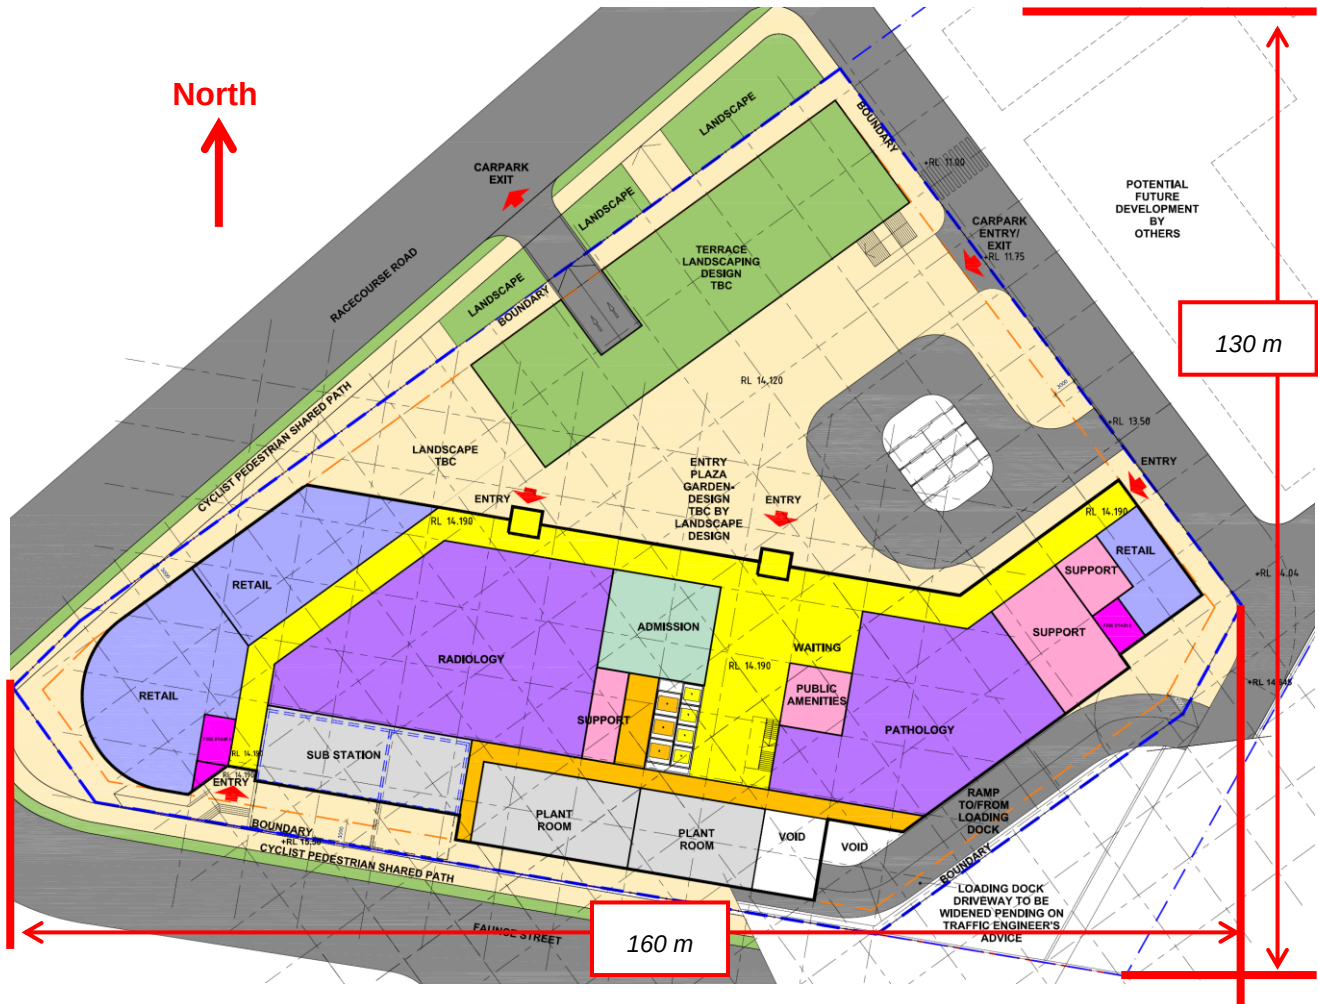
Ground level plan (Stage 1) of the proposed development showing the approximate dimensions.
